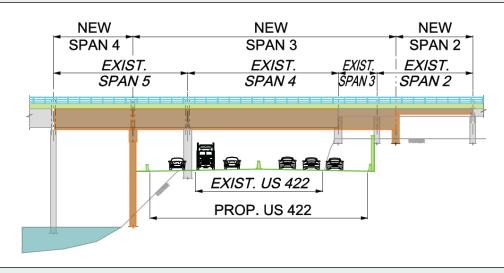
Option to Replace Only Impacted Spans on Rail Road Bridge
